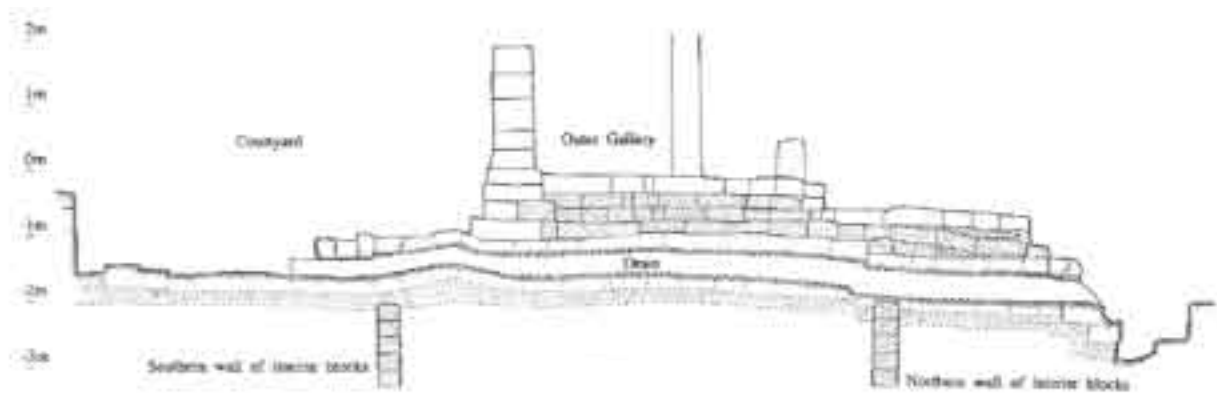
The section plan of culvert, JSA, 1999.
